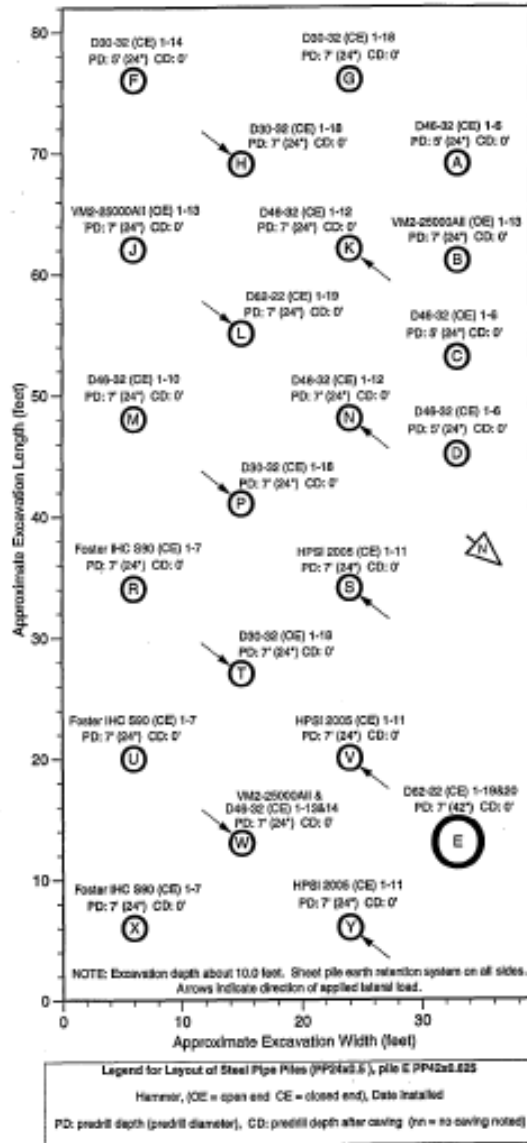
Plan View of Test Pile Layout- Site 4 (Lemke, 1997)
